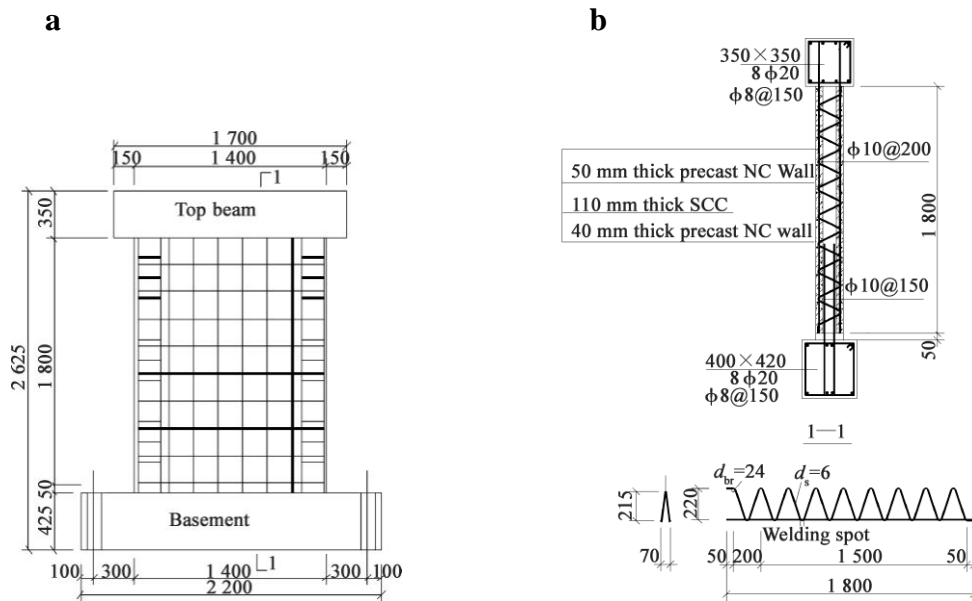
Reinforcement details of composite shear walls: a) elevation of test specimen; and b) sketch of cross bridging
